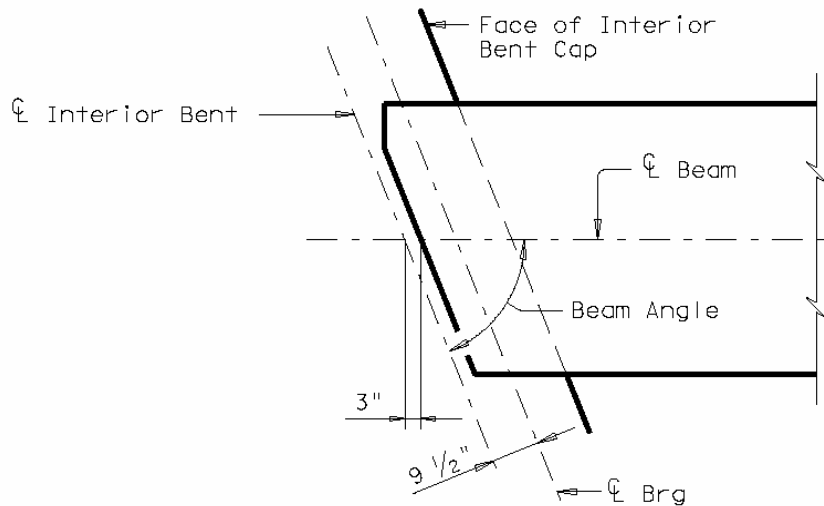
Girder End Detail for Texas U54 Girders (TxDOT Standard Drawing 2001).
